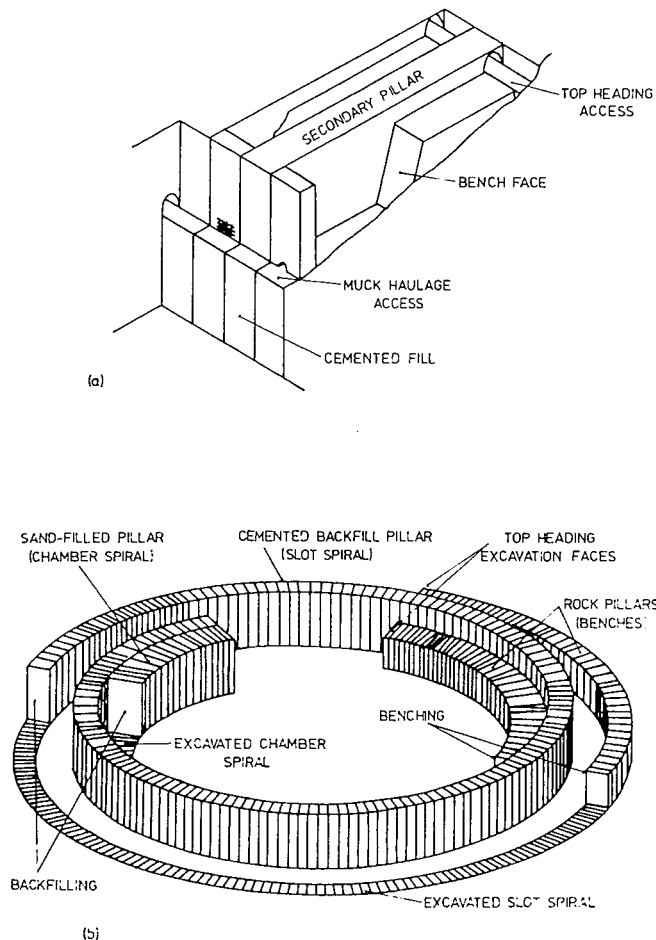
(a) Slot and fill mine layout (after Brechtel, 1987). (b) Spiral slot and fill mine layout (after Dixon, 1990).
